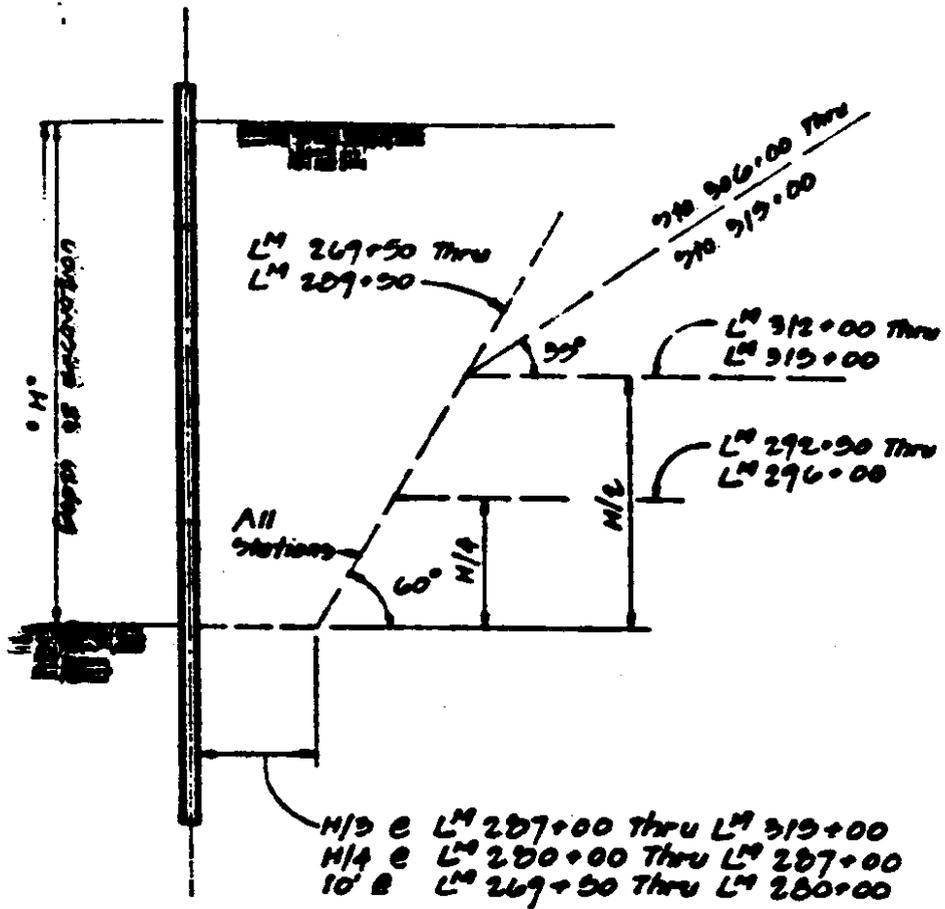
Geometry of No-Load Zone for Typical Section of Tieback Wall
